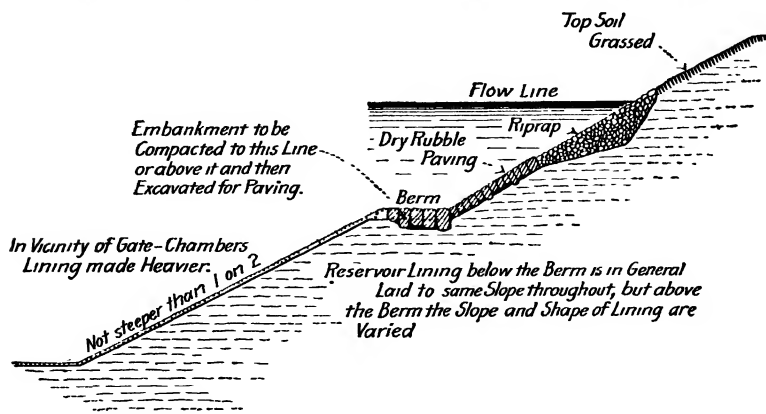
Hill View Reservoir, New York City. Typical details of lining.
